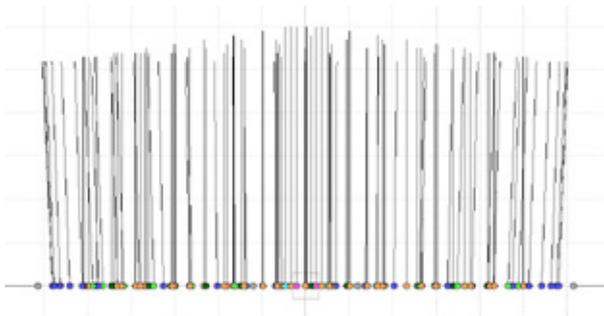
Drill plan with tapered shape (Underground Manager).
